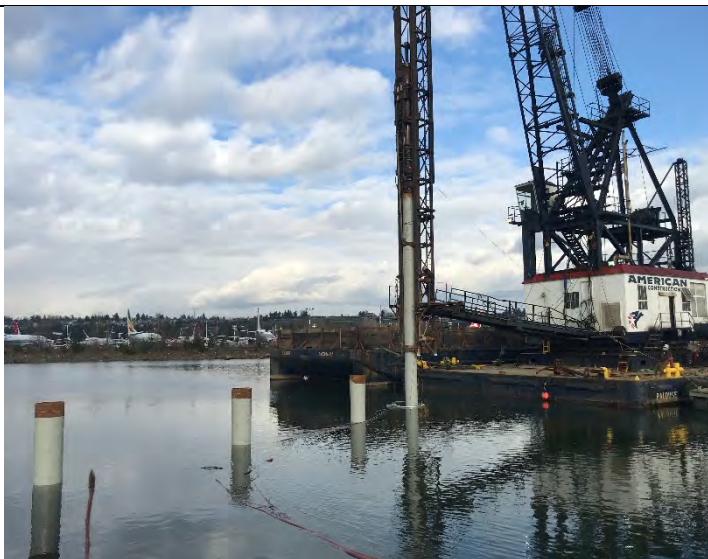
Setting up D62-22 impact hammer to drive pile P-07 on 2/10/21. Looking east.
